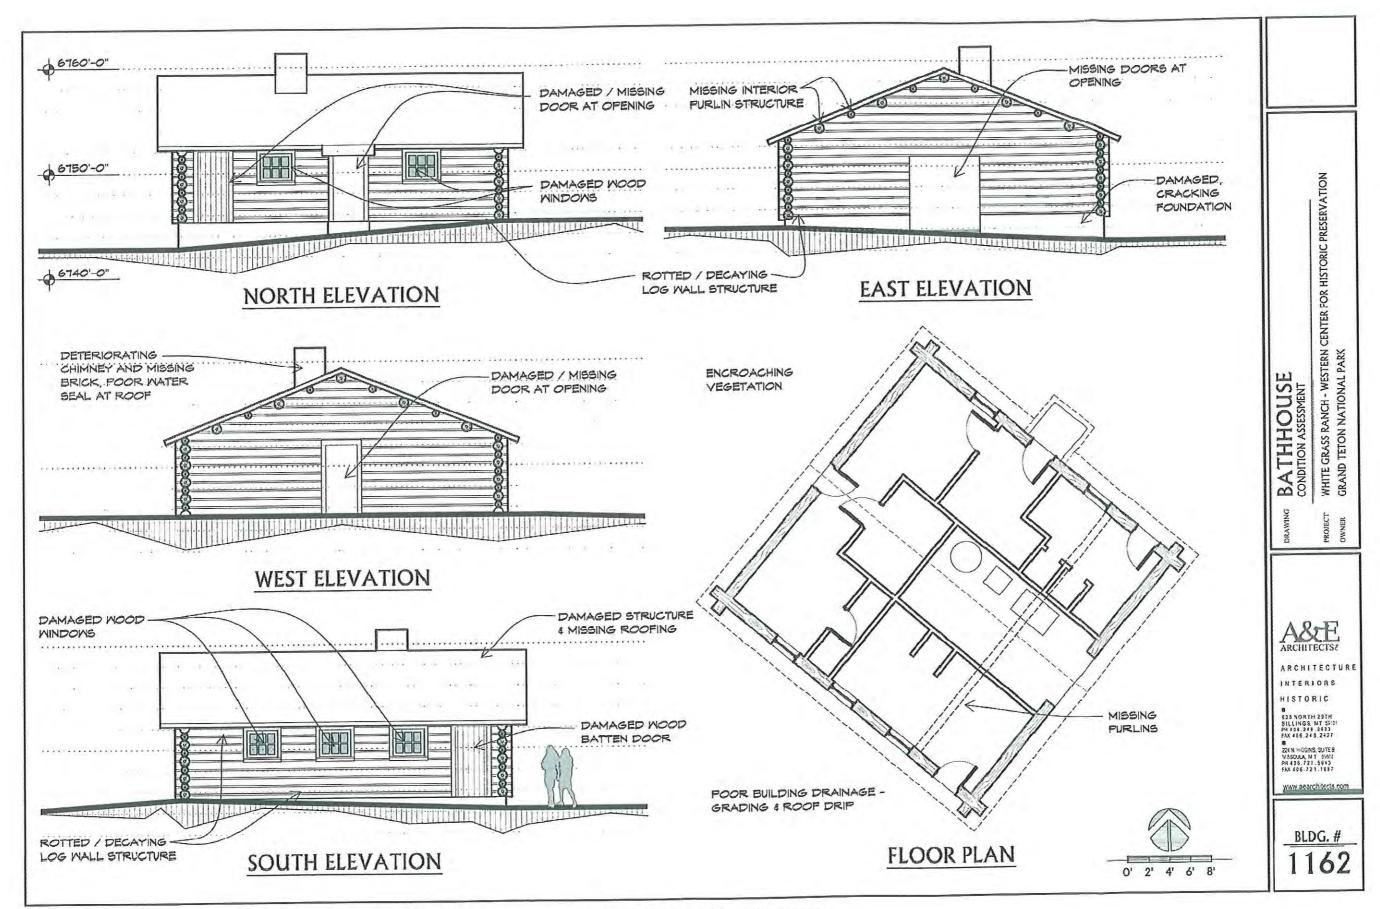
Existing conditions plan and elevations of HS-1162, the Bathhouse, showing areas of deterioration (A&E: 2006).
